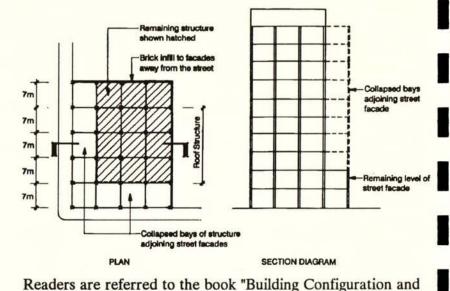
Secretariat of water supply, Mexico City, after collapse of the top 8 storeys of the first bay adjoining street facades.
